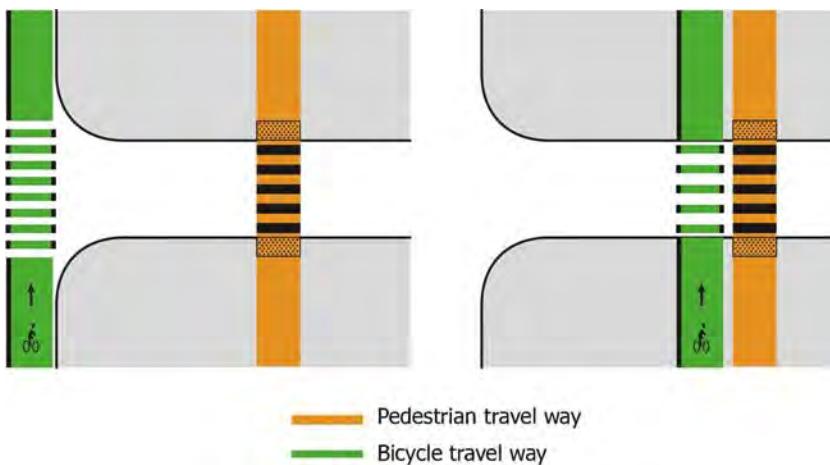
Street-level bike lane at side street/ramp entry with green conflict markings (left) and sidewalk level separated bike lane at side street/ramp entry with green conflict markings (right).
